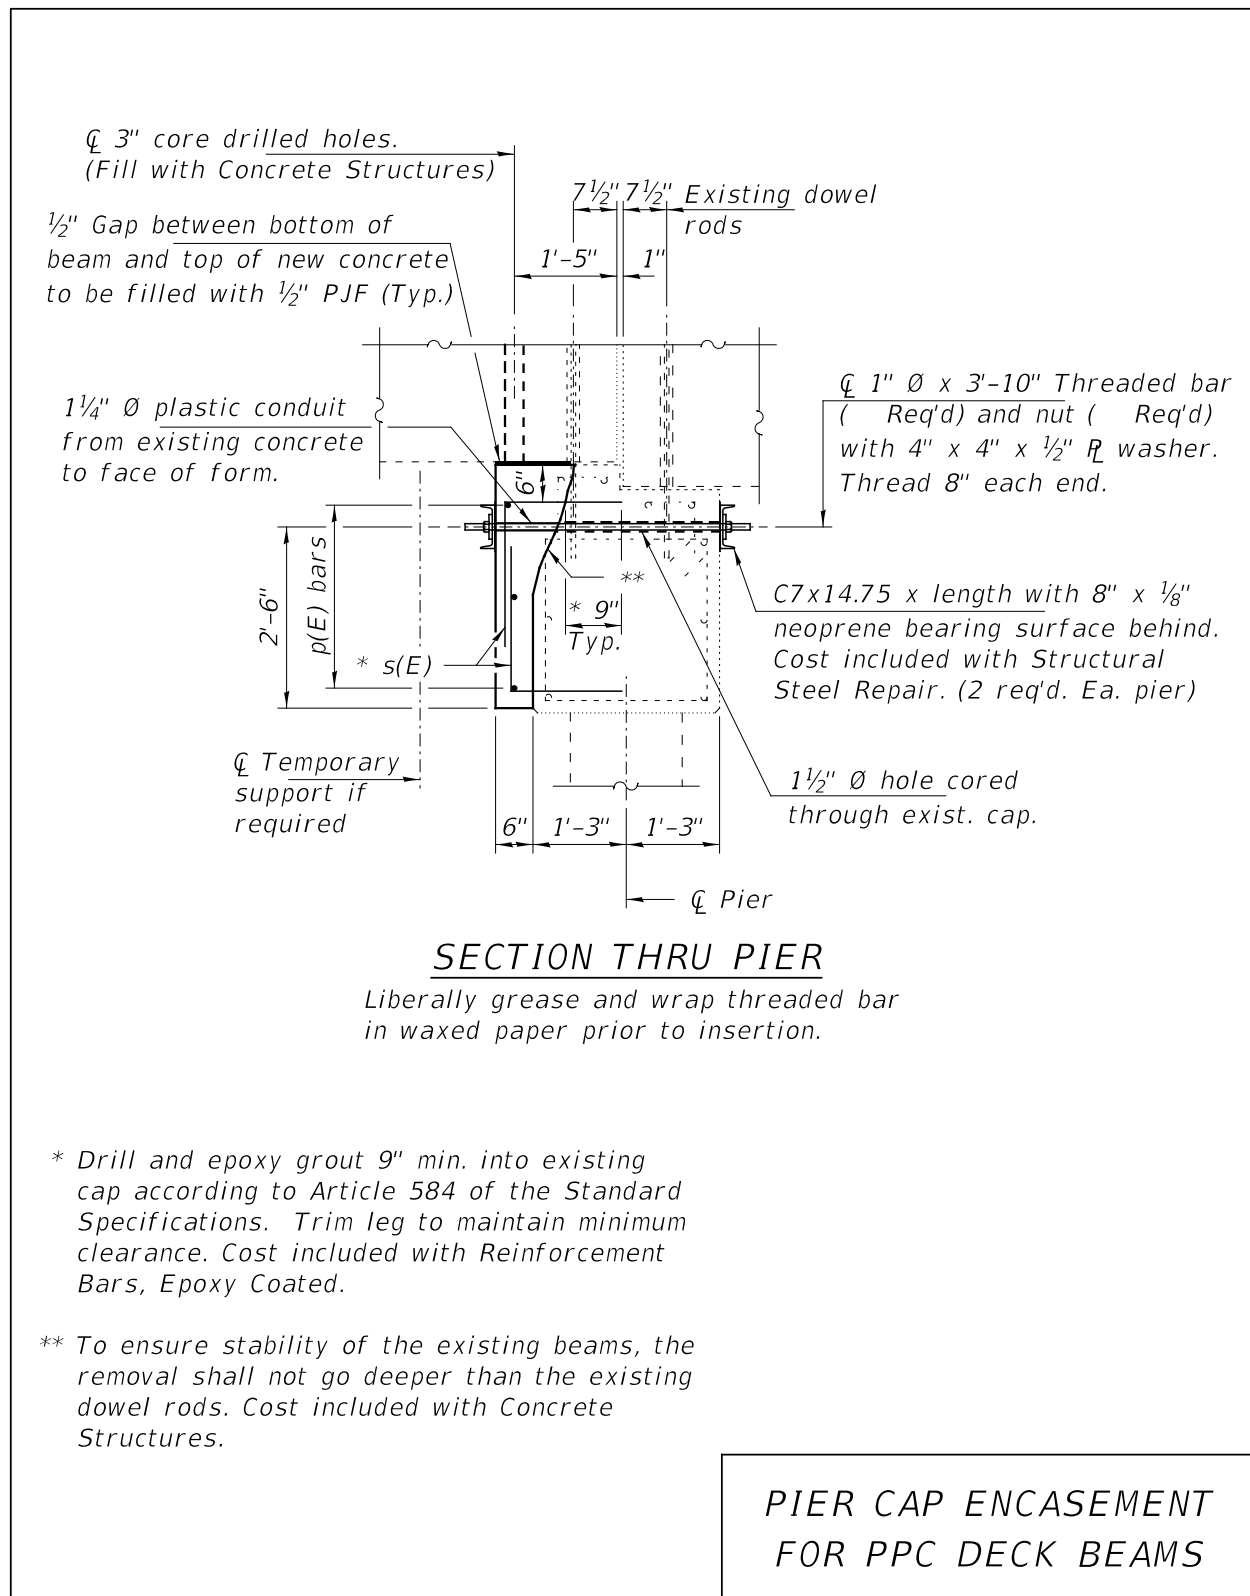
Pier Cap Encasement for PPC Deck Beams
